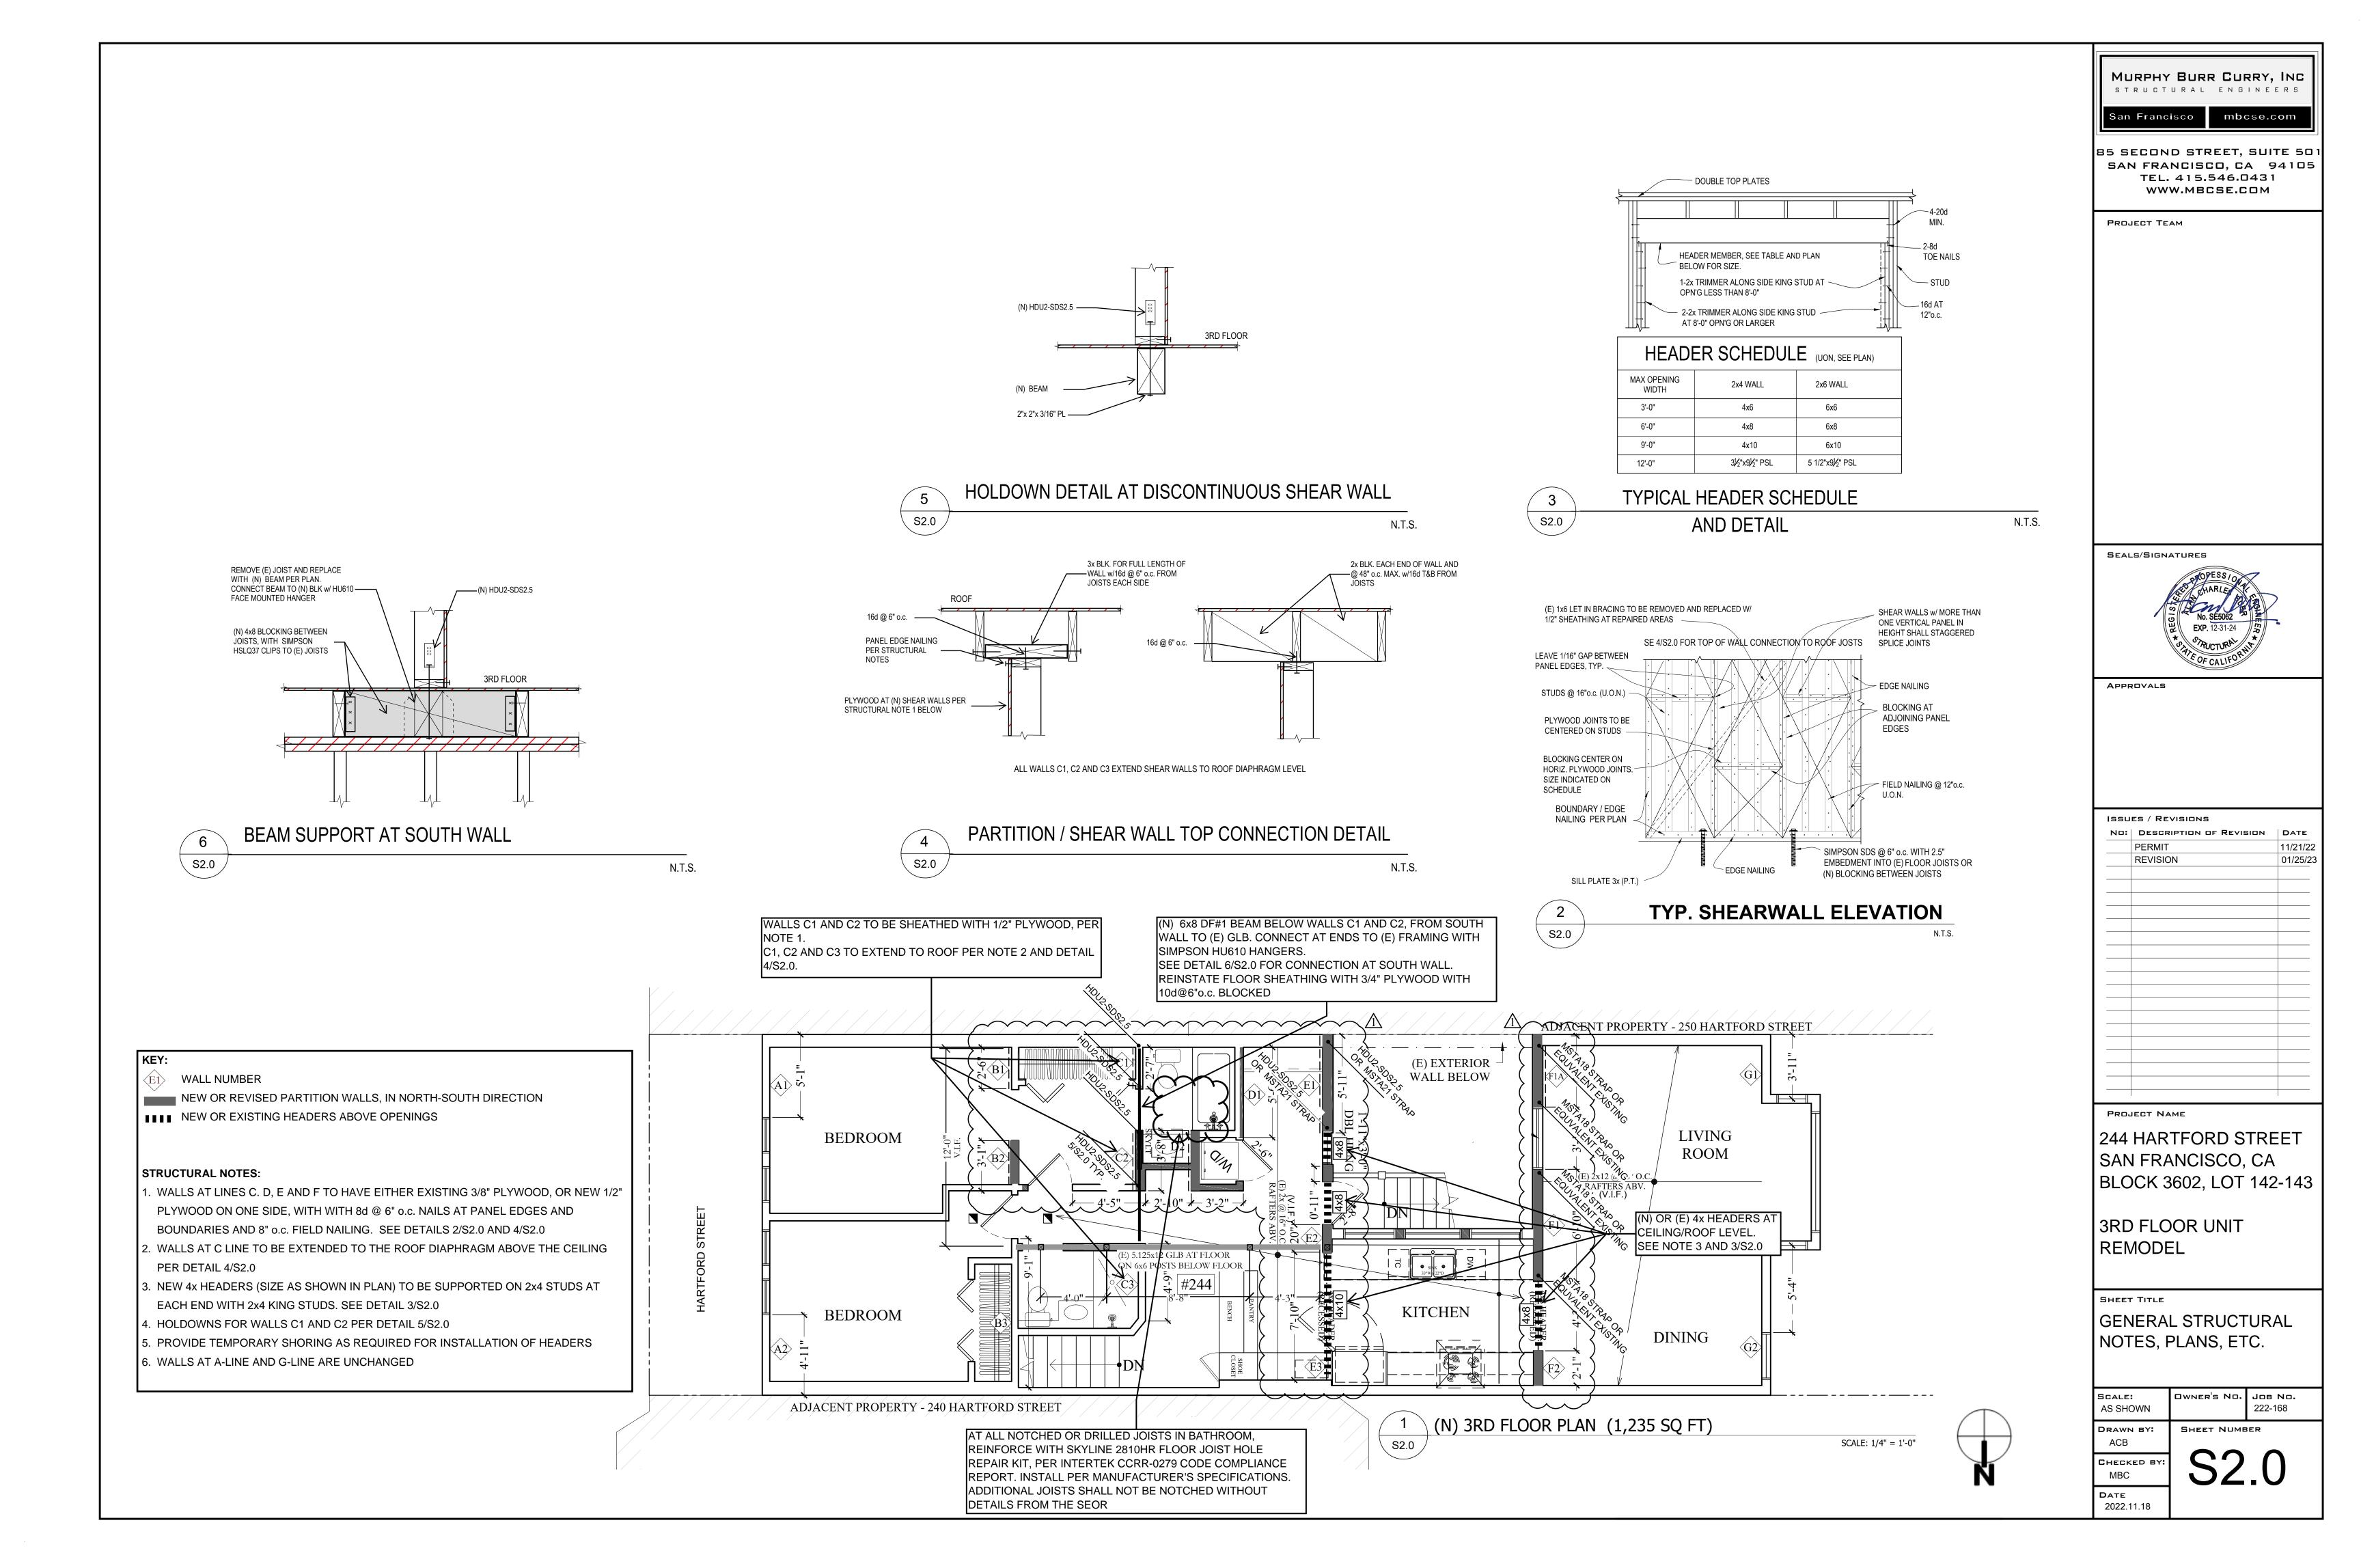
EXHIBIT H: New Permit calculations to address relevant seismic strengthening
